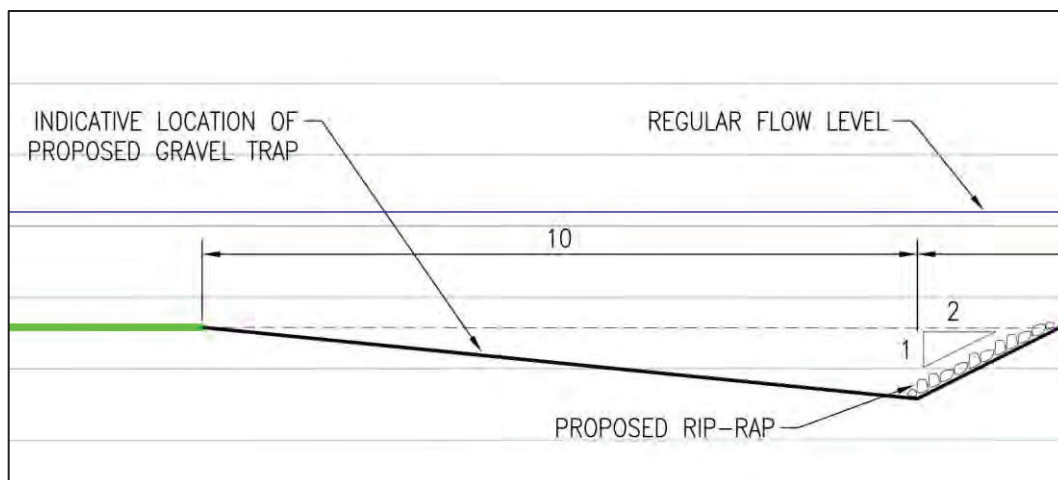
Gravel Trap Cross-section. Not to scale.
